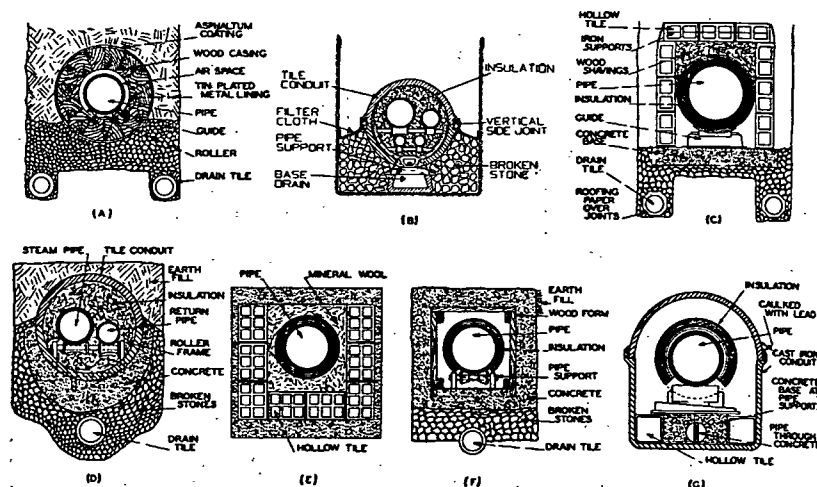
CONSTRUCTION DETAILS OF CONDUITS COMMONLY USED
